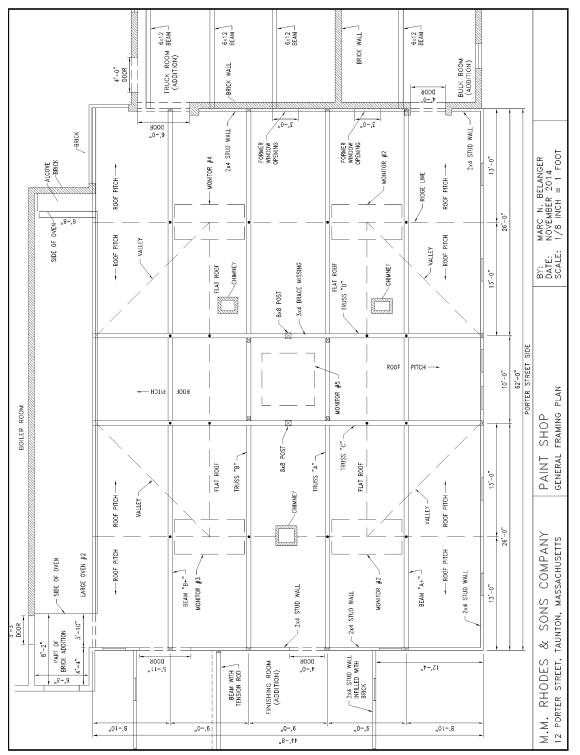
Measured Drawing. Paint Shop General Framing Plan.
